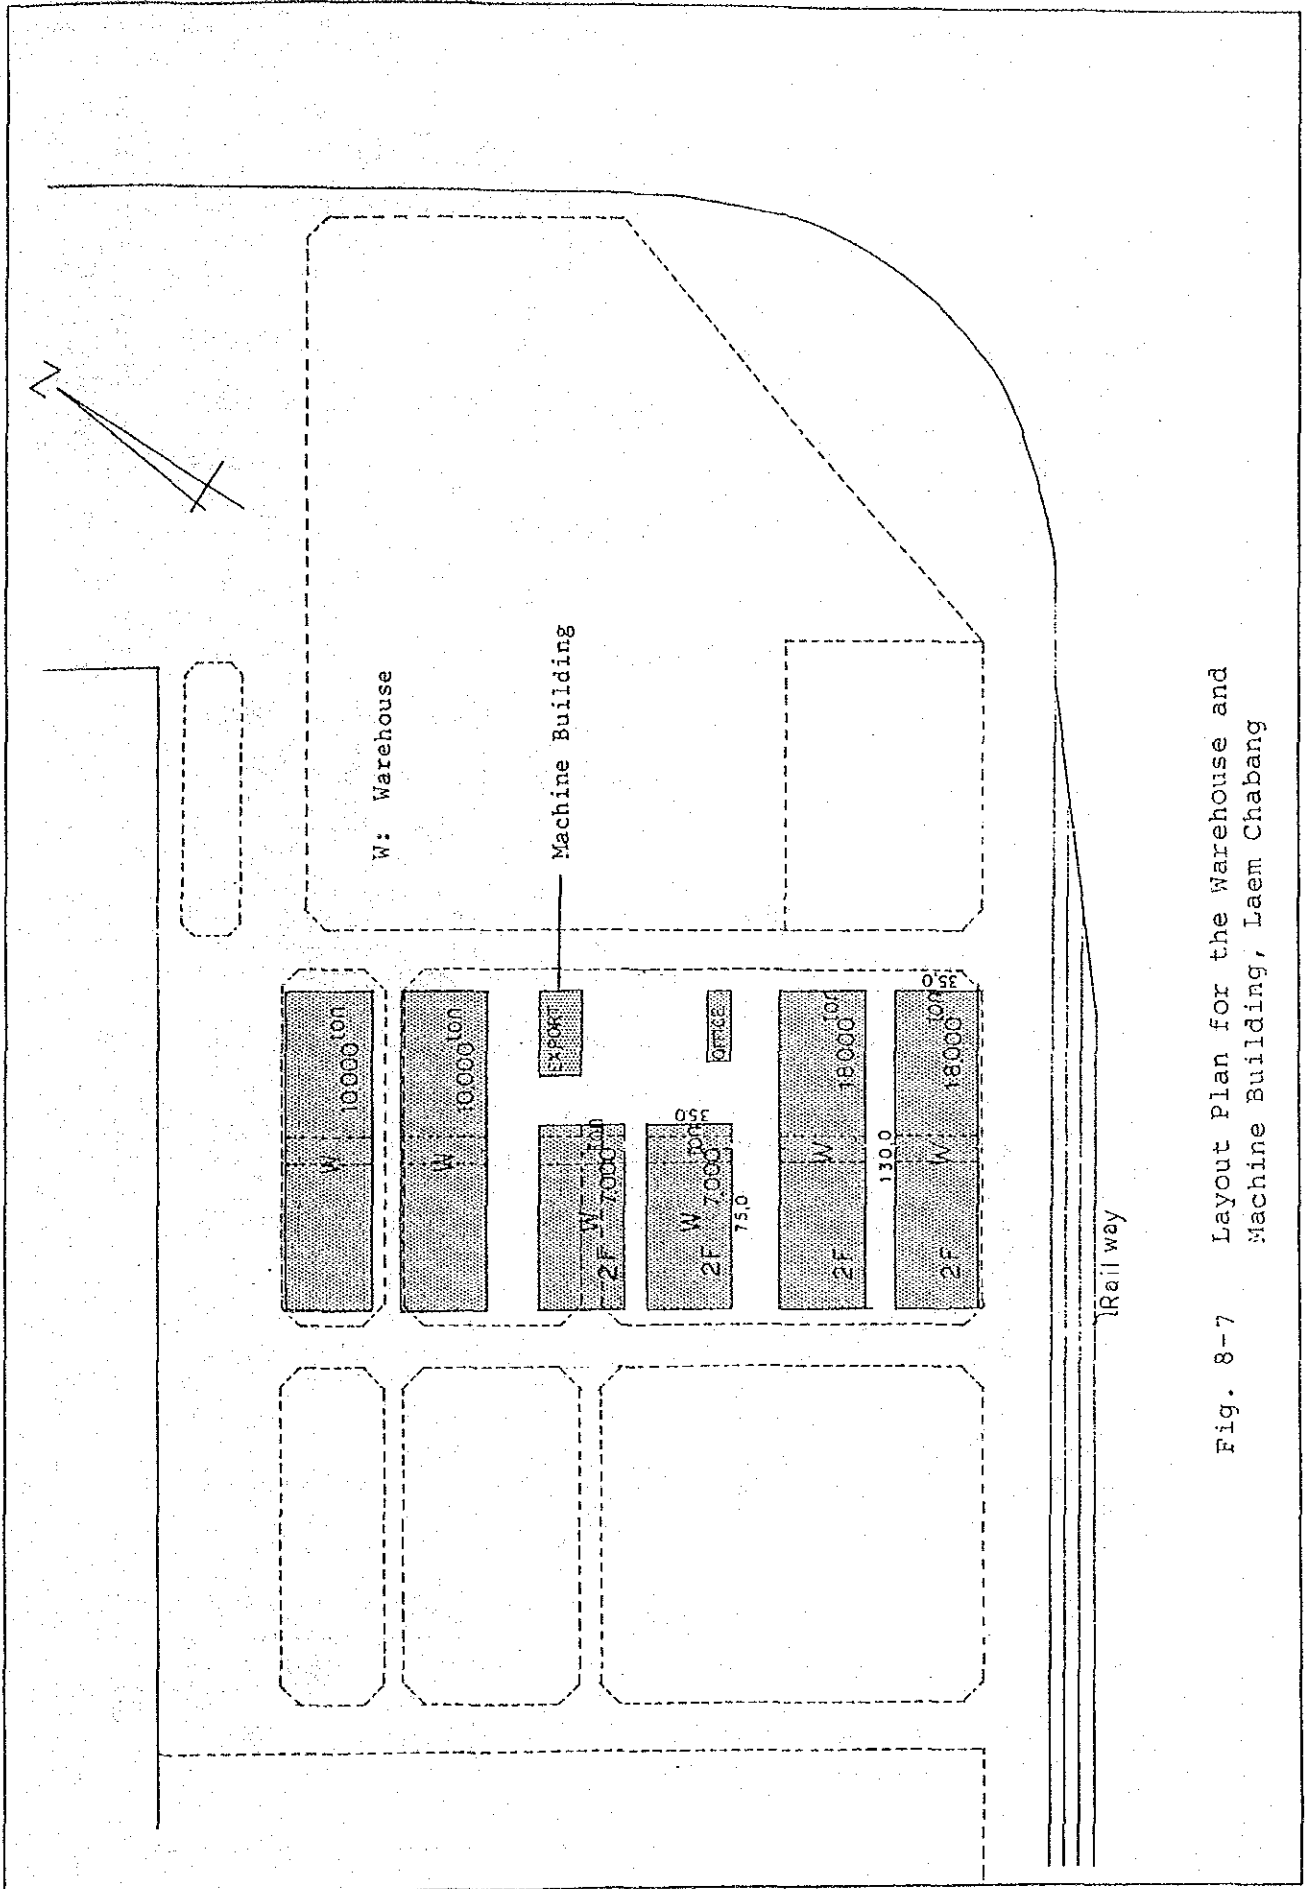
Layout Plan for the Warehouse and Machine Building, Laem Chabang
